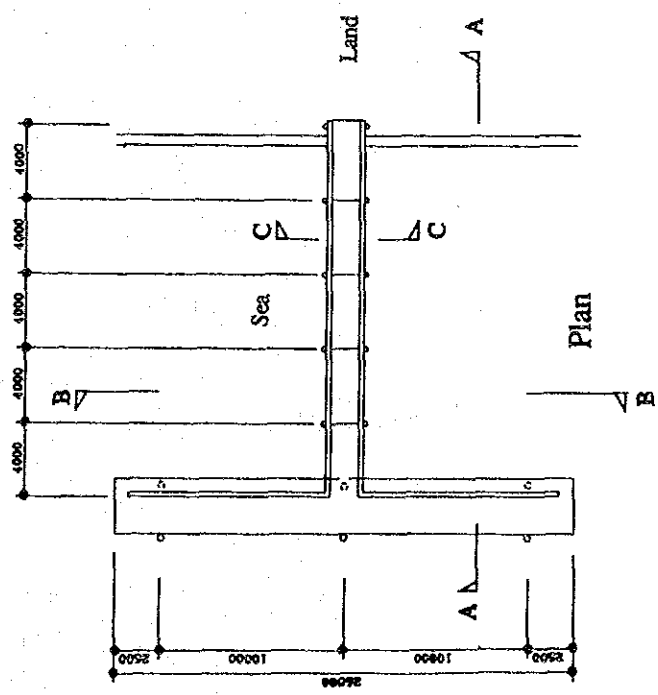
Plan of Jetty showing beam / pile cap arrangement S=1/150
